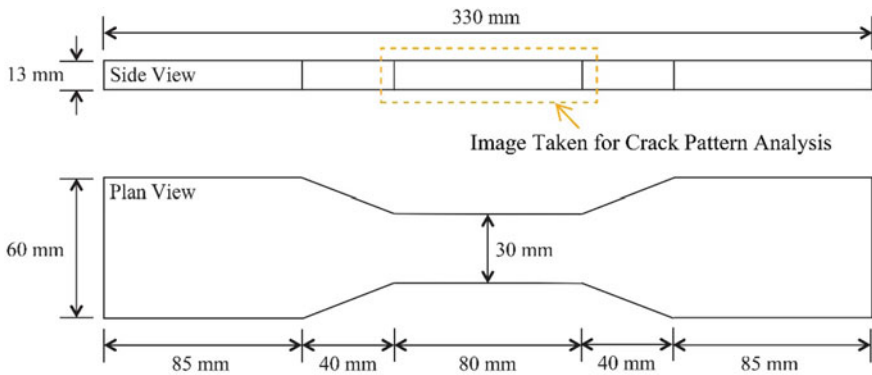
Dimensions of dumbbell tensile specimen recommended by JSCE
